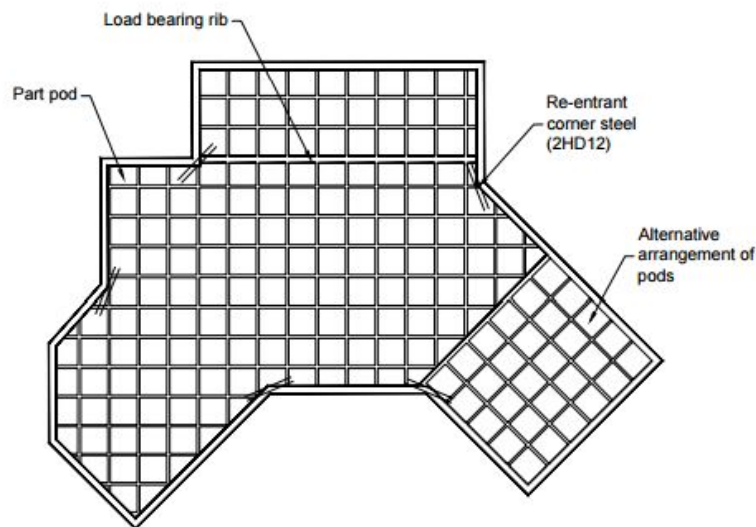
Rib-Raft Beam and Pod Layout
